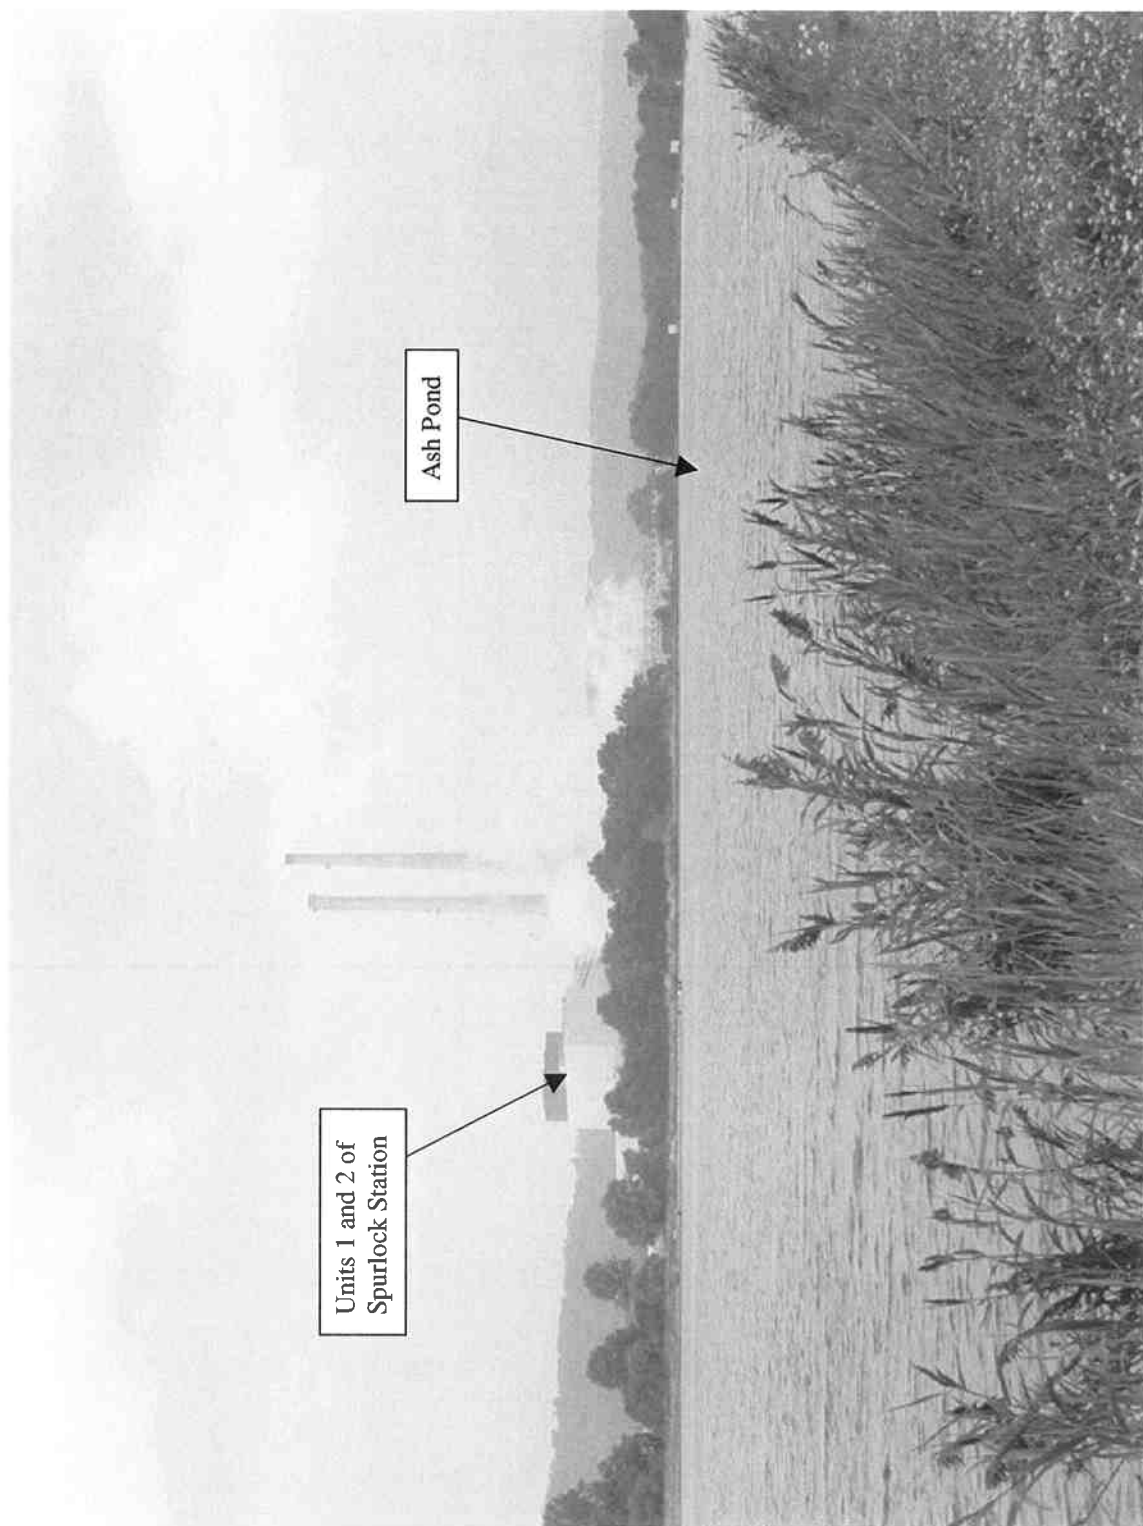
Facing South. Ash Pond in Foreground, Spurlock Station in Background.
